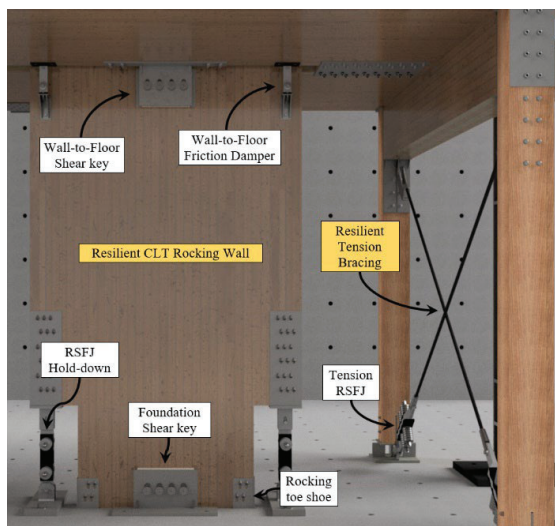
Components of the resilient rocking wall, tension bracing, and shear key locations.
